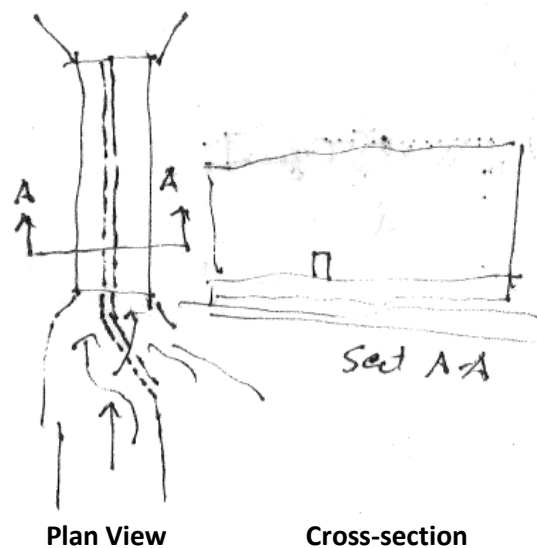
B. Plan view and cross-sectional sketch of simple concept design.
